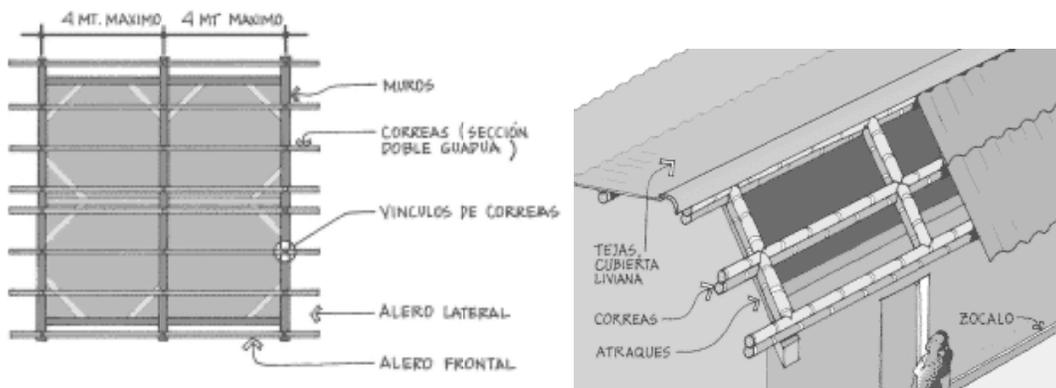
Recommended beam spans and connections in typical Guadua roof construction (AIS,2001).
